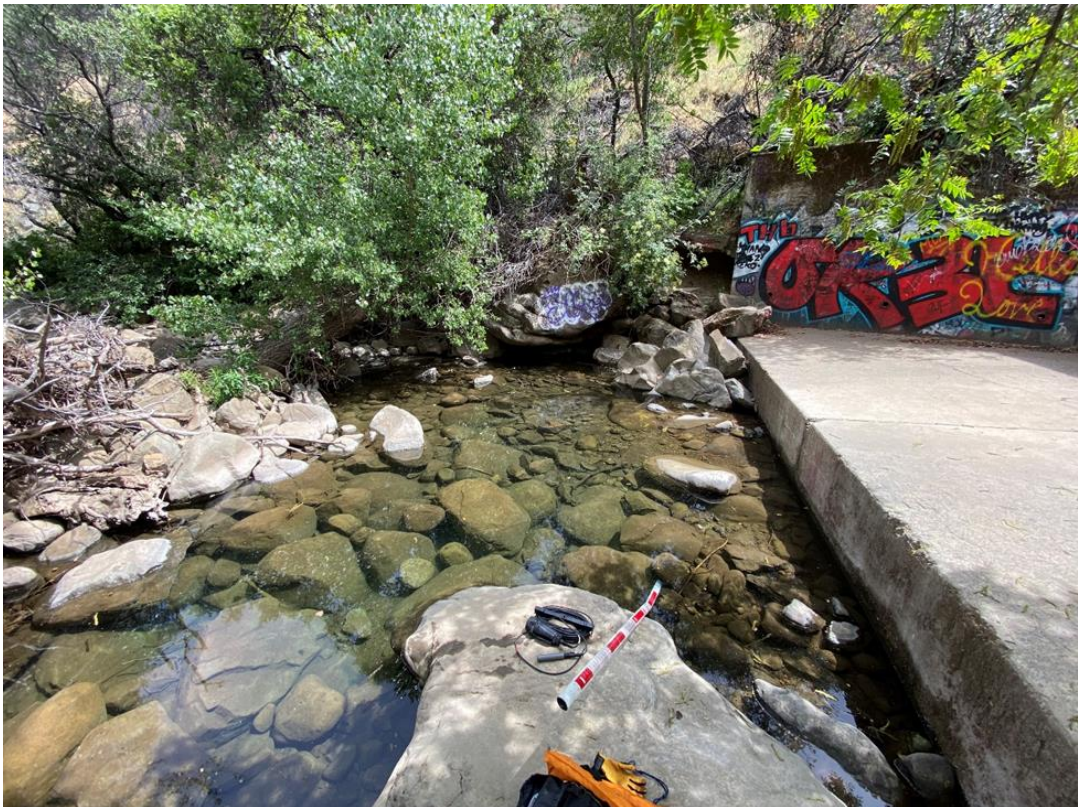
Pool below the concrete apron of the Hwy 128 road culverts.
